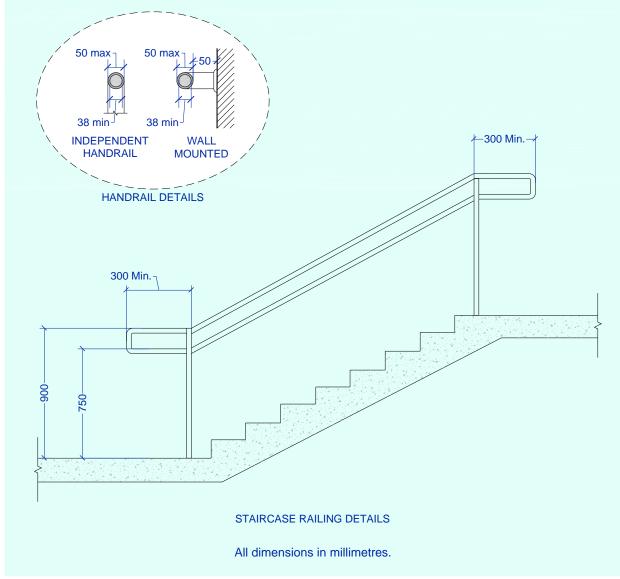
Handrails for steps and stairs (Source: NBC, 2016)
